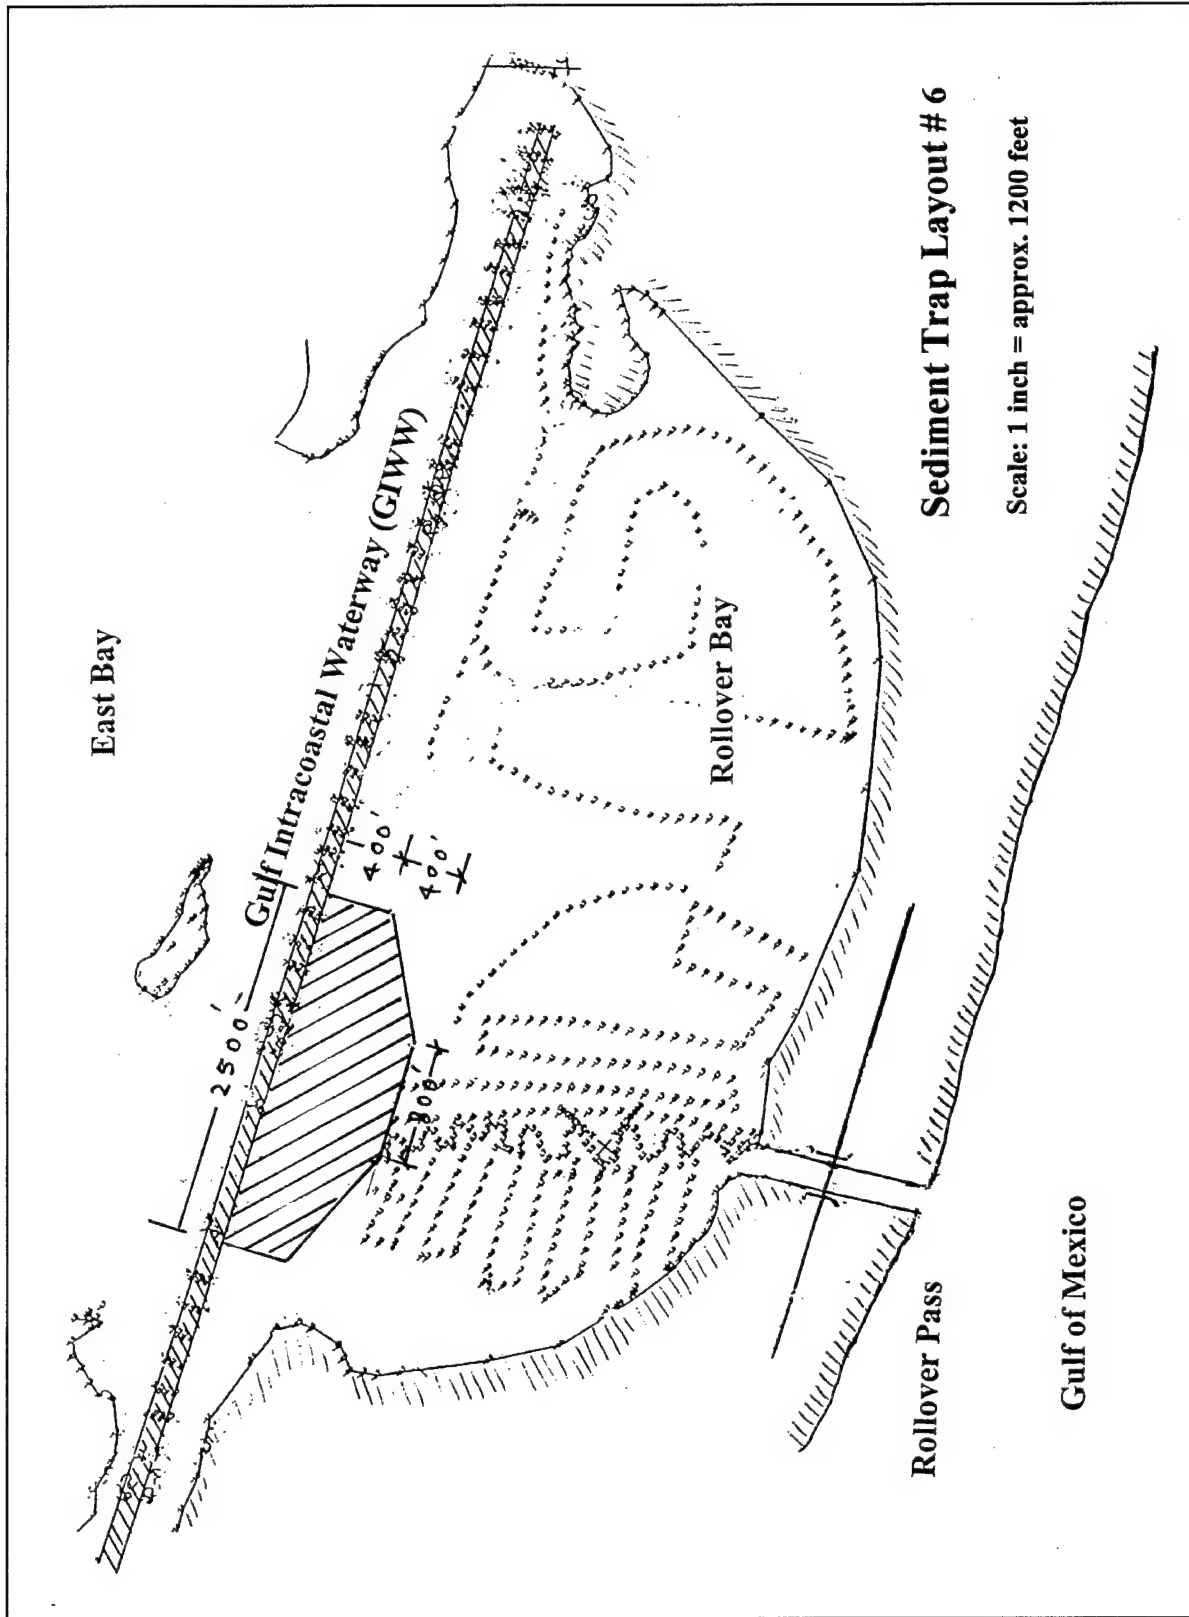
Sediment trap Layout 6 (Distance is in feet. To convert feet to meters, multiply by 0.3048)
